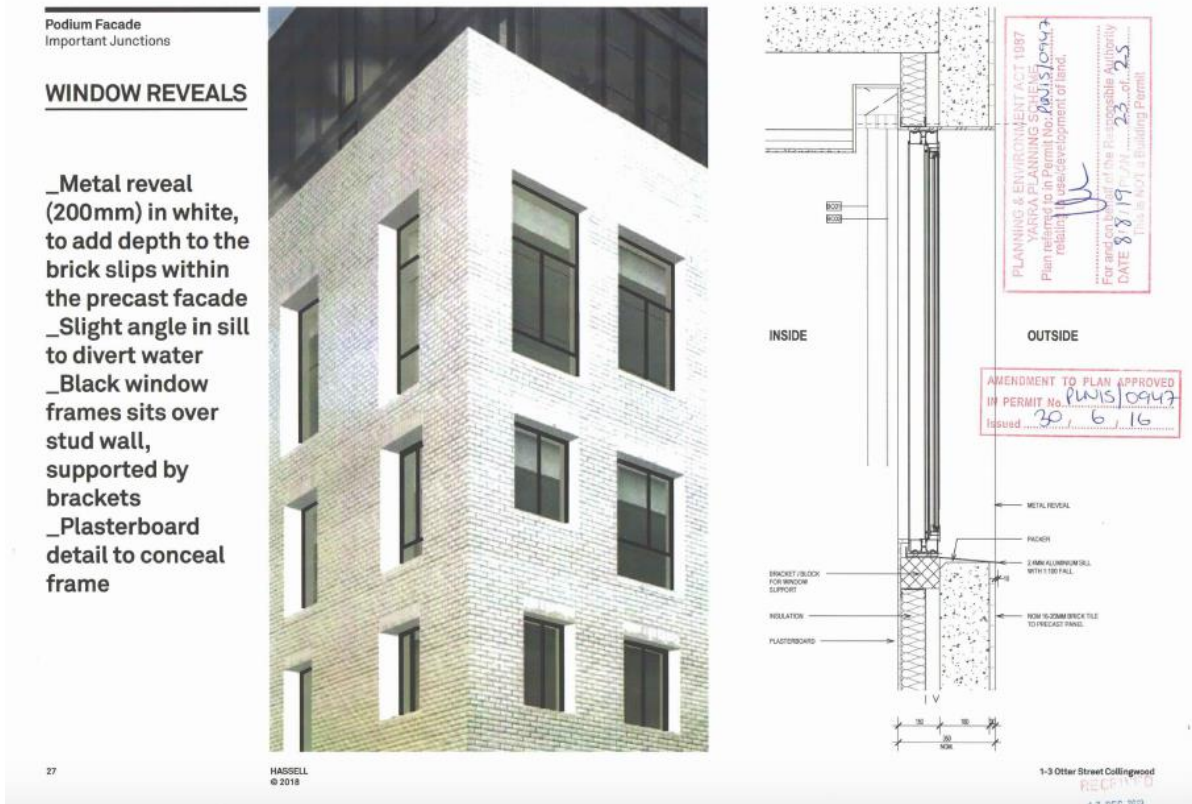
Details of window reveals within existing endorsed plans to be reinstated via condition
